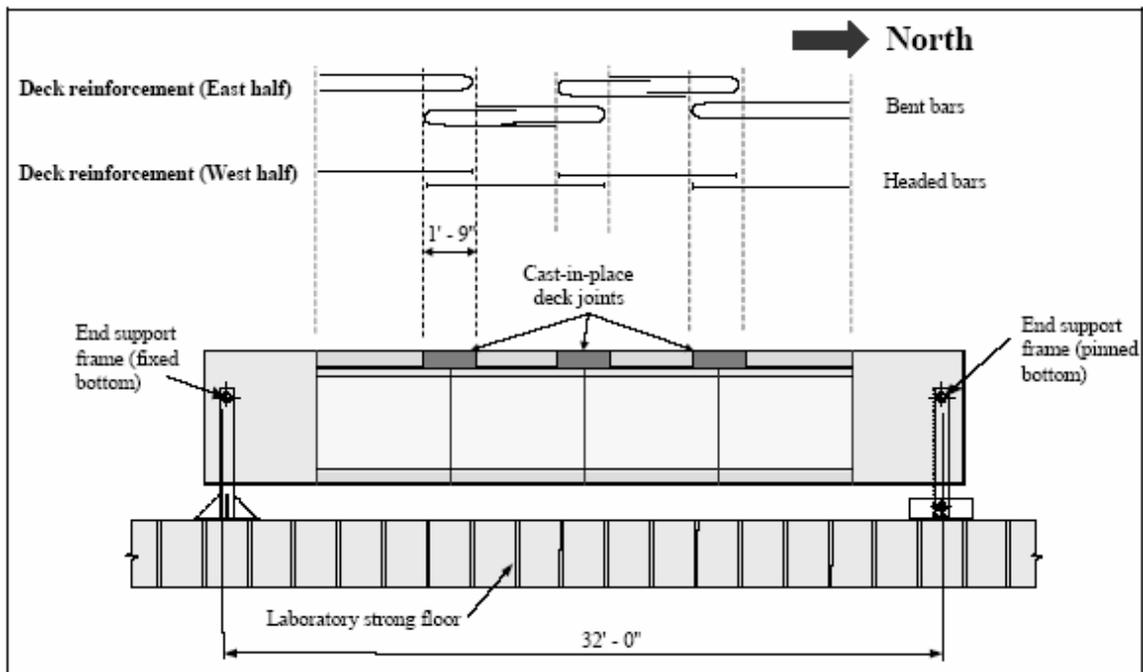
Cast-in-place Deck Joint for Test Unit 100INTCIP
